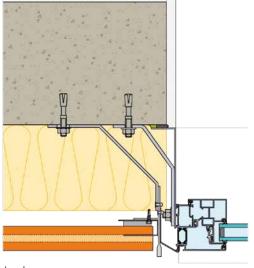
DETAIL : WINDOW FRAME FLUSH WITH OUTSIDE WALL
